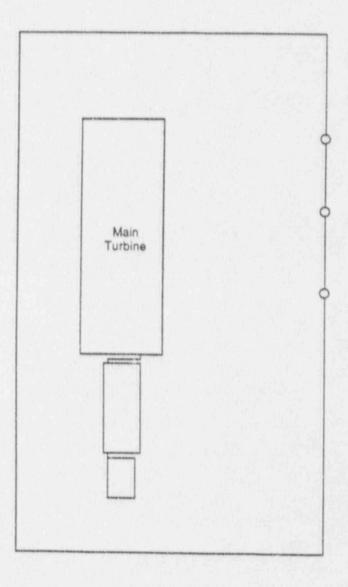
Rancho Seco Turbine Building, Elevation 40 ft.
